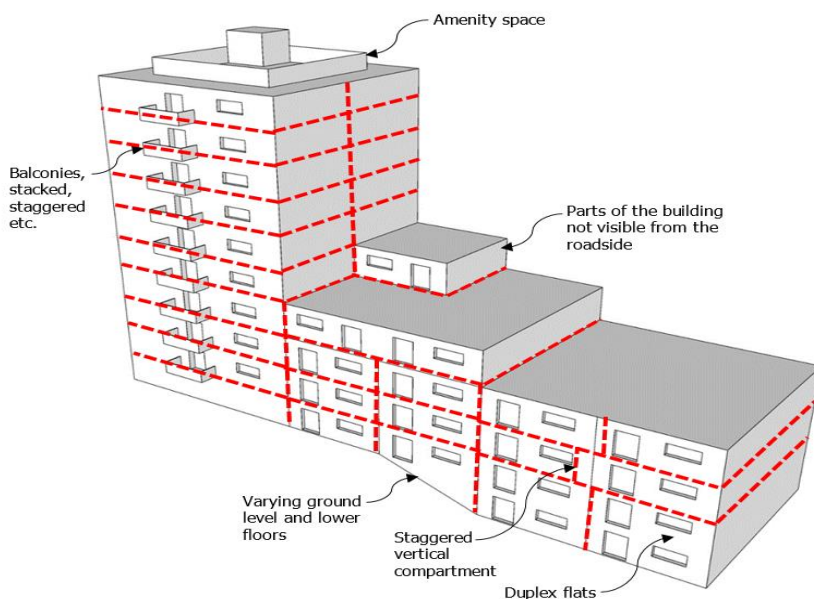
Buildings with compartment or separating walls/floors and any special features
